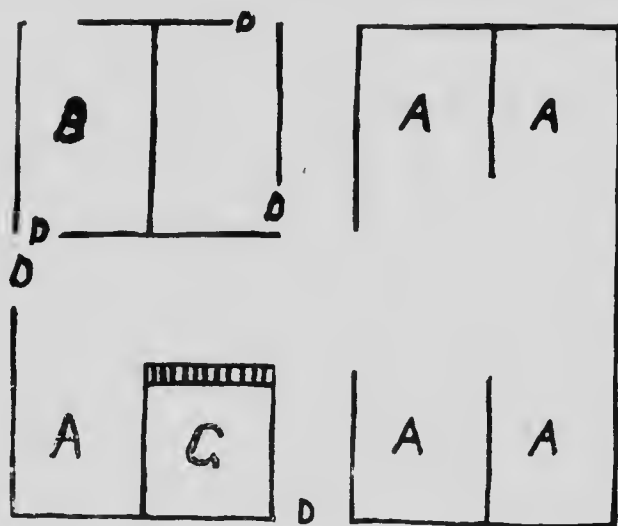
Ground floor plan of barn shown in figure 93. A good farm barn. A—open stalls; B—box stalls; G—grain.
